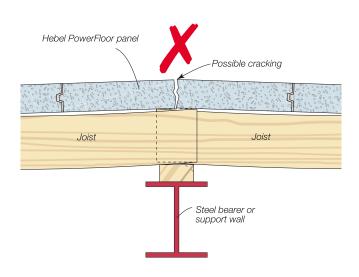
Control Joint Over Bearer/Support Wall
